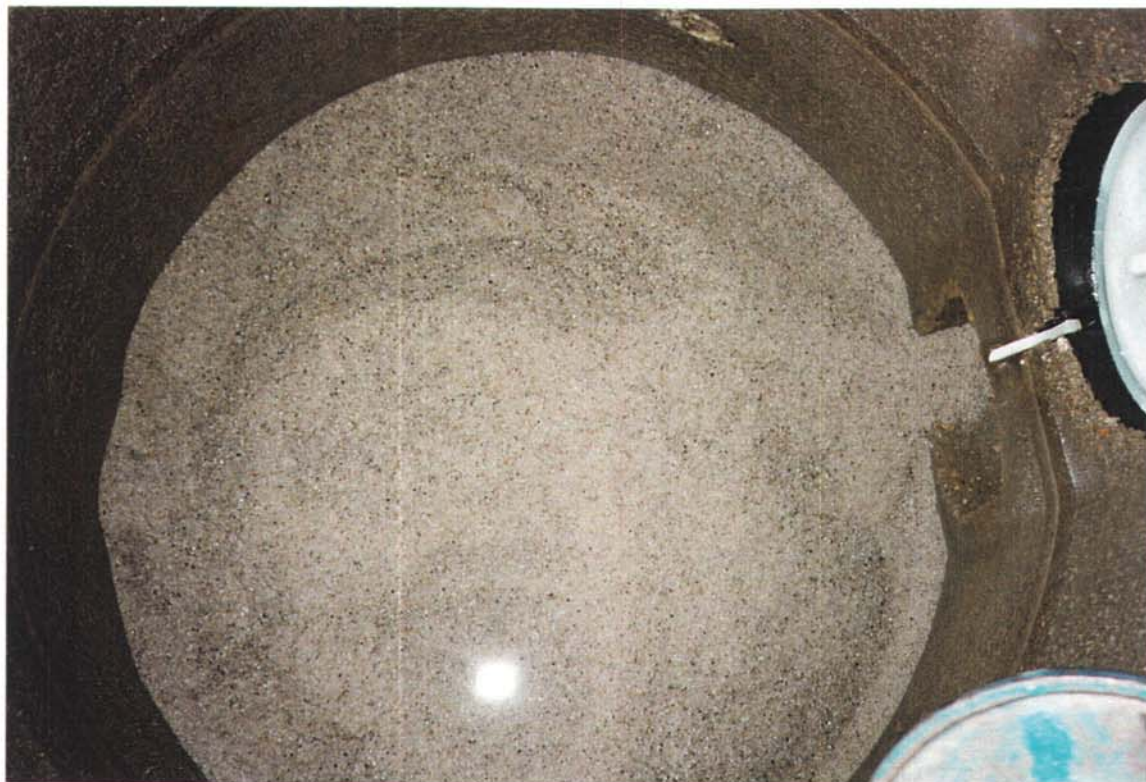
Concrete pot, trapped, accreted sediment at bed elevation of 500mm (natural bed)
